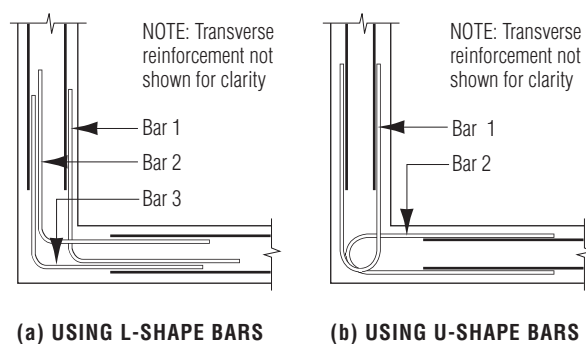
Placing Order of Reinforcement in Walls
